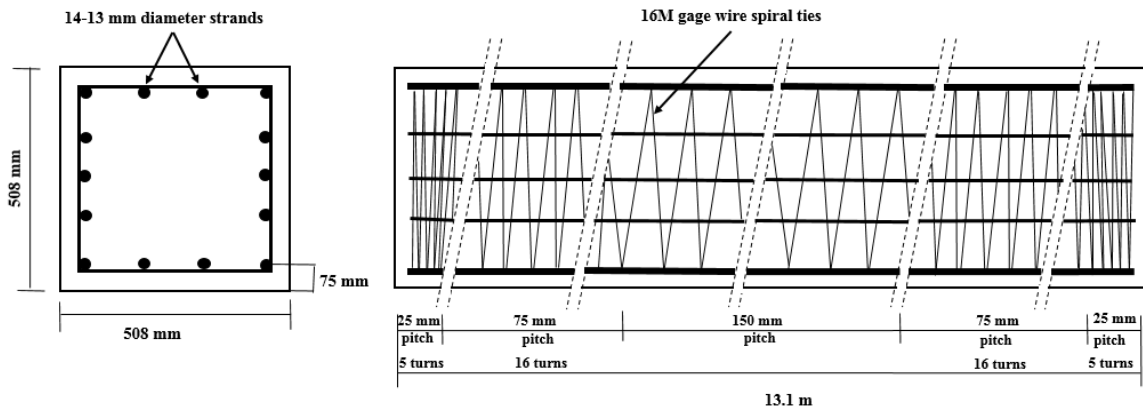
Details of prestressed concrete pile used in VDOT (Pando et al. 2006)
